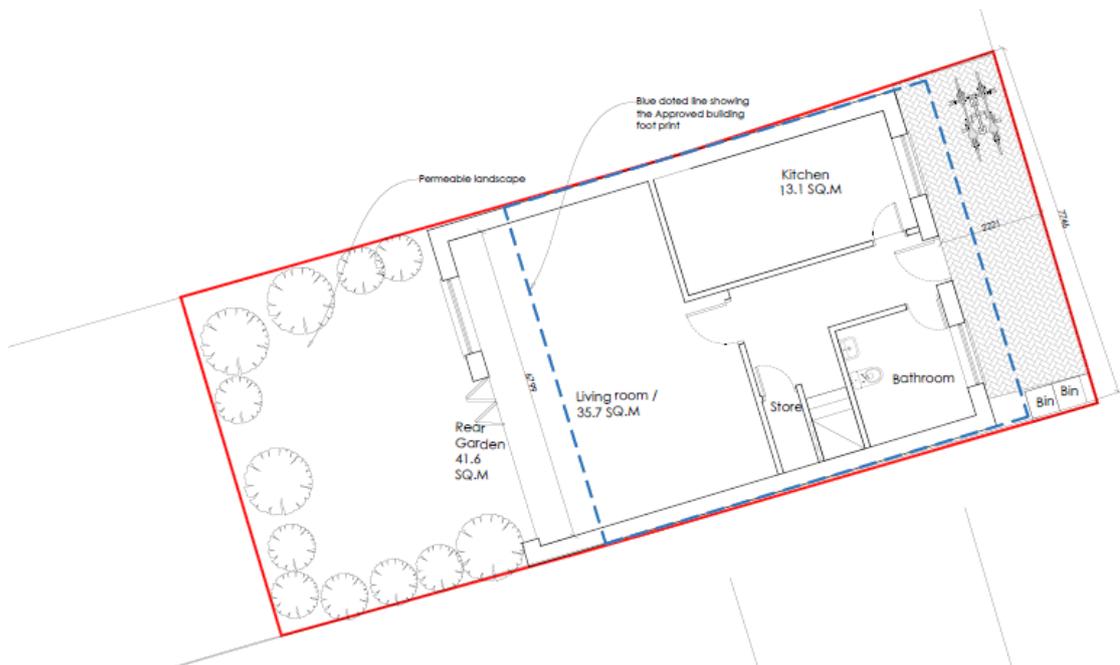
Footprint of the approved dwellinghouse overlaid on the proposed siting of the dwellinghouse
